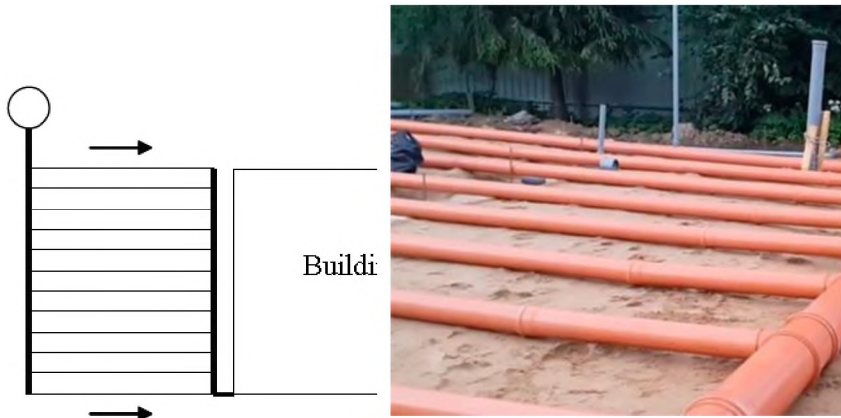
Tigelman Pipe Laying Scheme and in-situ photo
